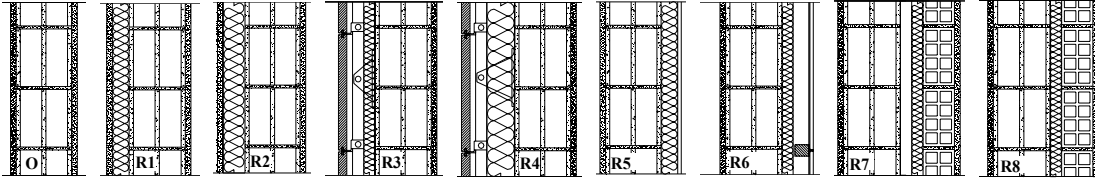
Vertical cross-section of the existing and rehabilitation construction solutions of the façade walls
